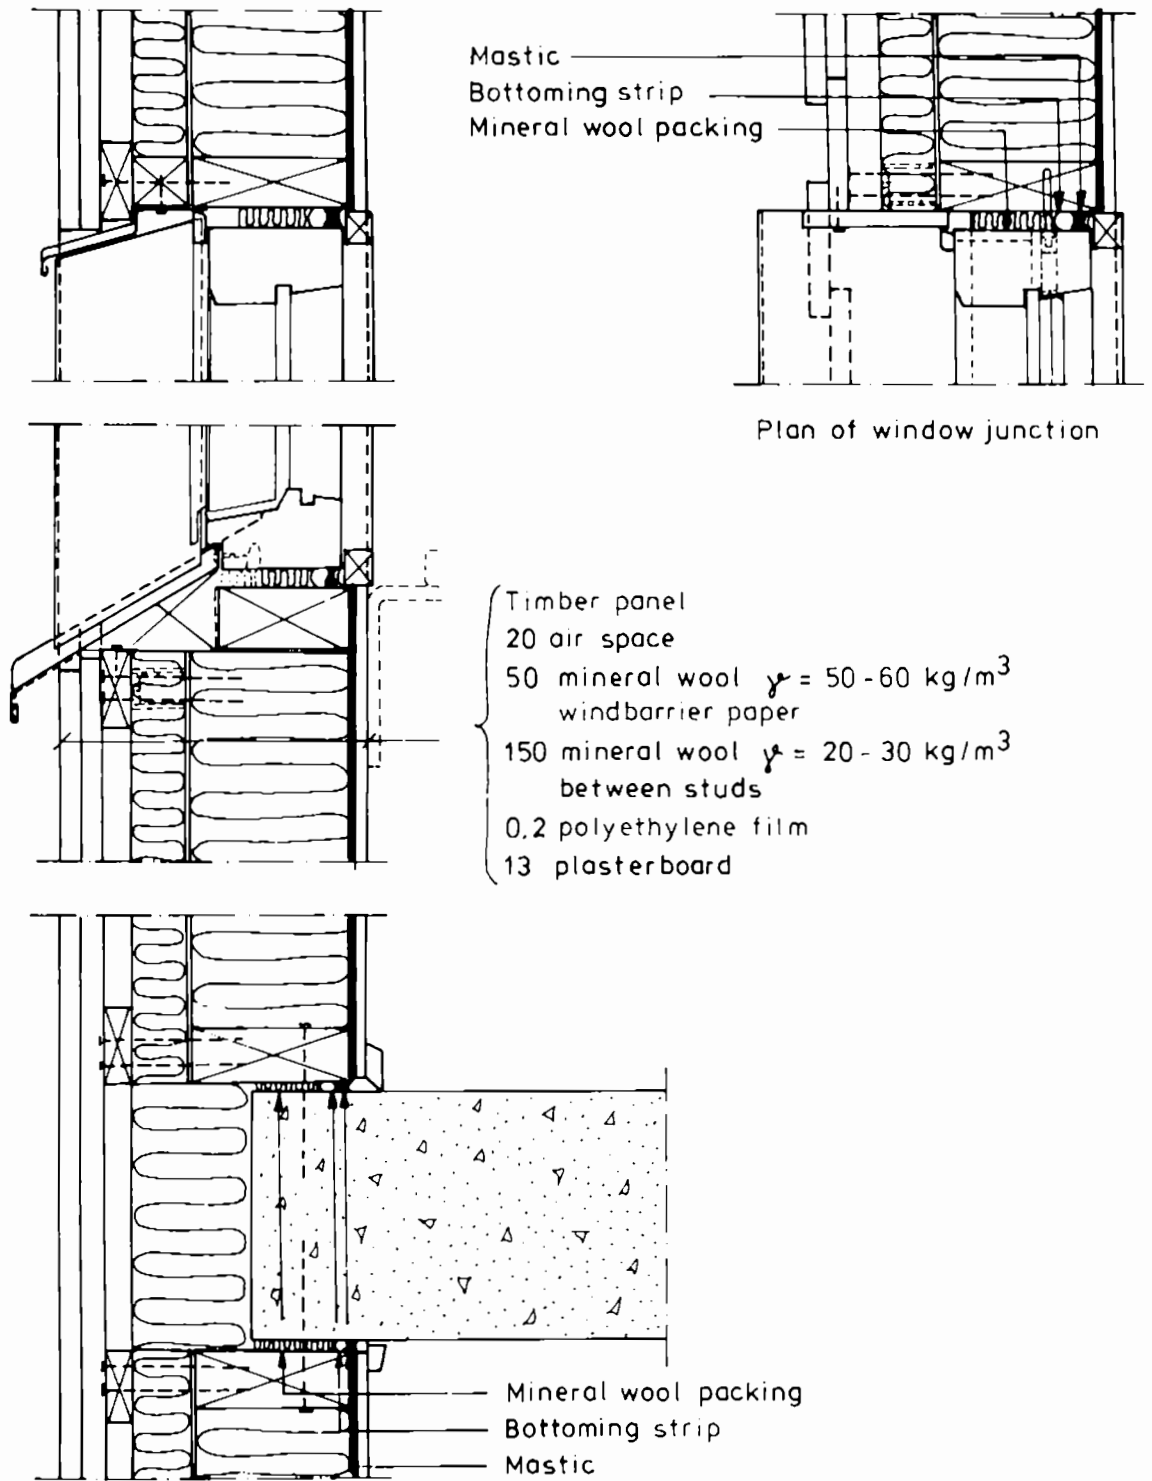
External wall made up of timber curtain elements with joints against joist structures and windows. It is particularly important that the air seal around windows is positioned so that tightness against the polyethylene film is achieved.
